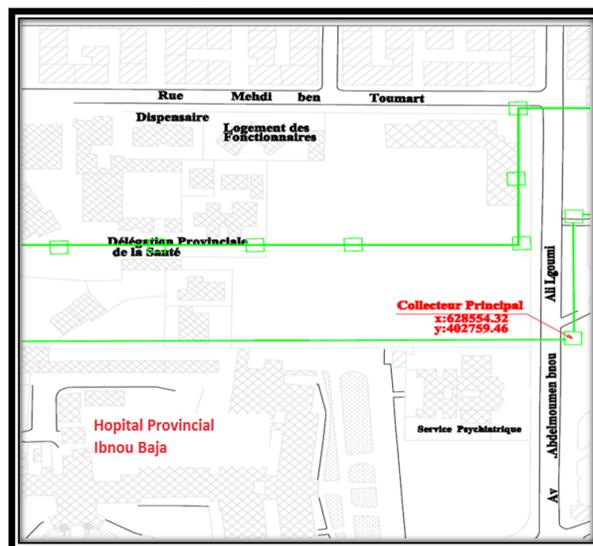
Typical sanitation plan (AWEDAT, 2014)
